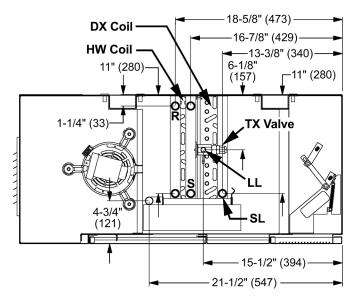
Direct Expansion and Steam Unit (Cooling Coil G[9], M[0], Heating Coils 68, 69)
